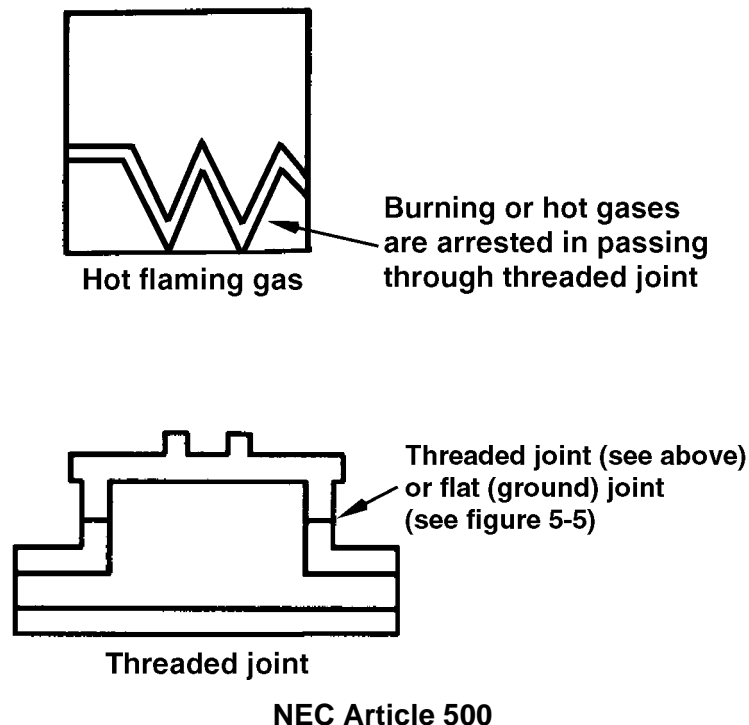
Threaded joints can be used as an escape path to cool the hot gases as they pass through the threads to the outside of the enclosure.
